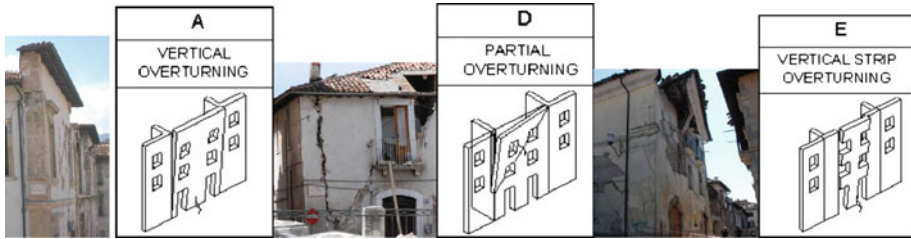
Out-of-plane mechanisms due to poor connections at corners: damage mechanism A, complete overturning of façade; damage mechanism D, partial overturning along a diagonal, mechanism E, partial overturning of the openings vertical strips
